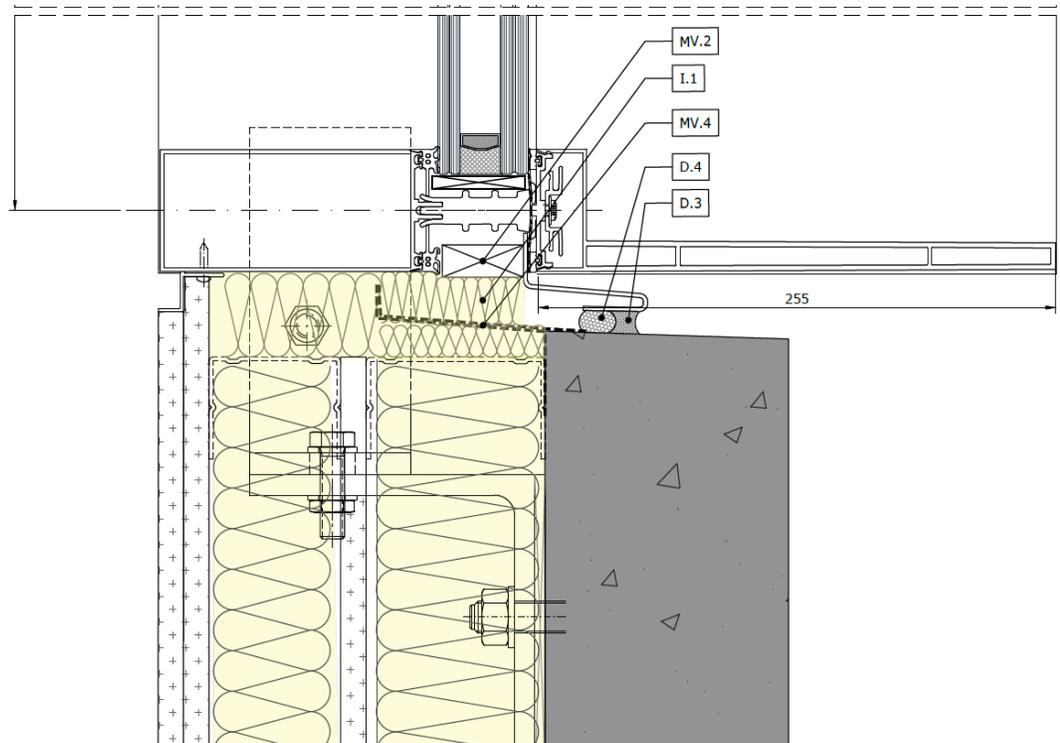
East Elevation WT-1C façade module typical Section Detail 3. Source: Author
